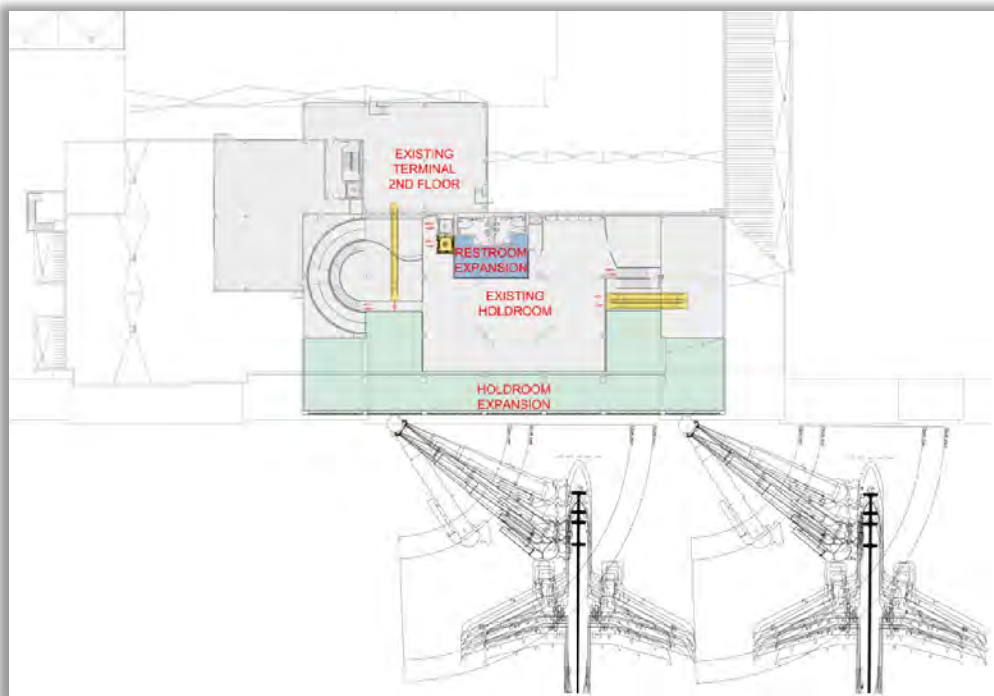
SECOND LEVEL TERMINAL BUILDING MASTER PLAN EXPANSION – PHASE ONE
